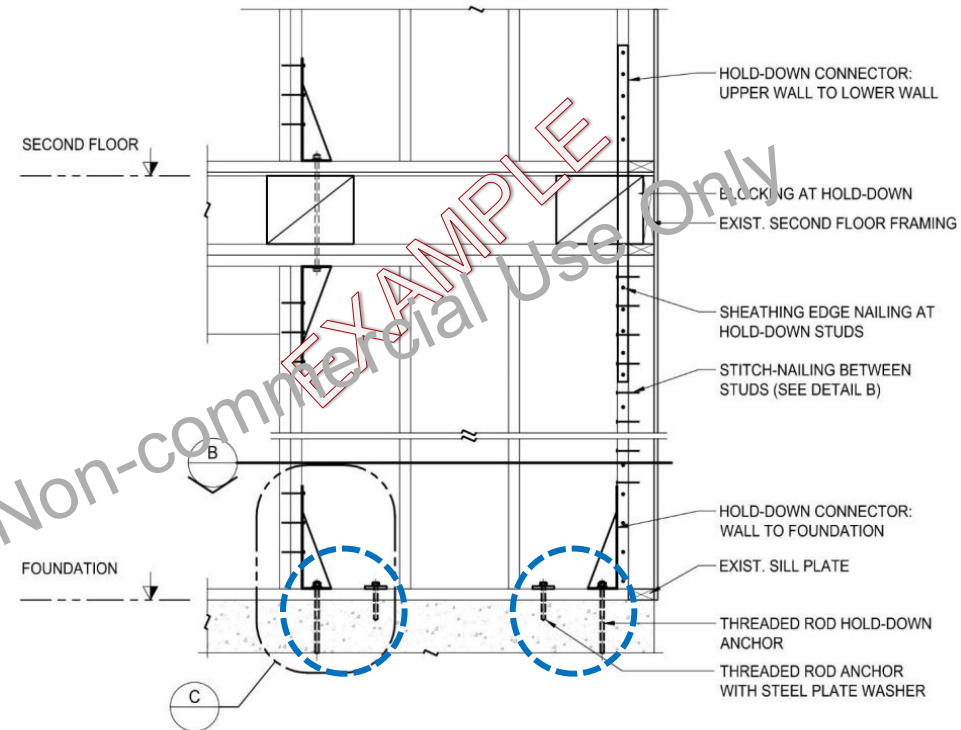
Additional anchorage of existing wood walls to concrete foundation
